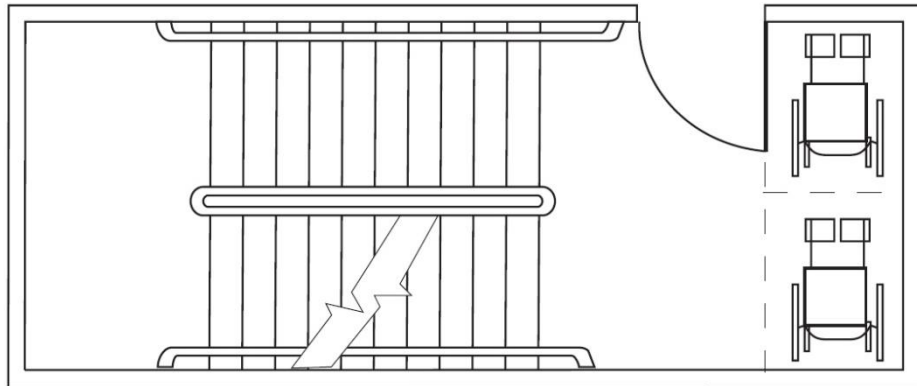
Exit Stair Used as an Area of Refuge.
